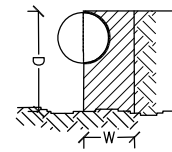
DETAIL FOR SAFETY BARRIERS ALONG TRENCH, EACH 10 METERS
